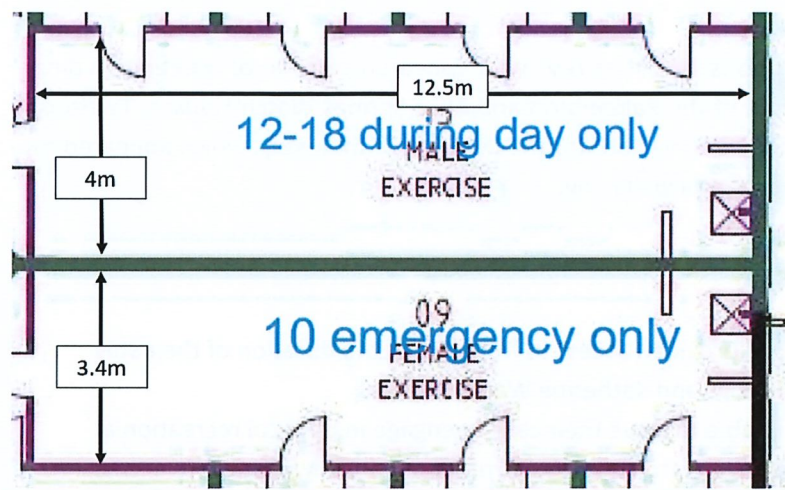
Katherine Watch House ‘exercise yard’ layout with measurements. Floor plan provided by NT Police.
